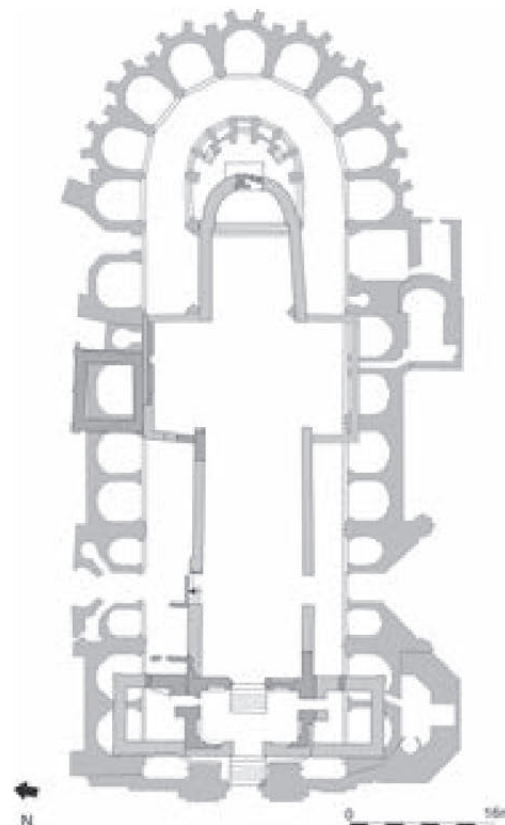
Restituted plan of Saint Mary's in Girona. Grey: Gothic building. Dark Grey: Excavated structures. Light grey: restituted structures (drawing author) (Plate 21)
